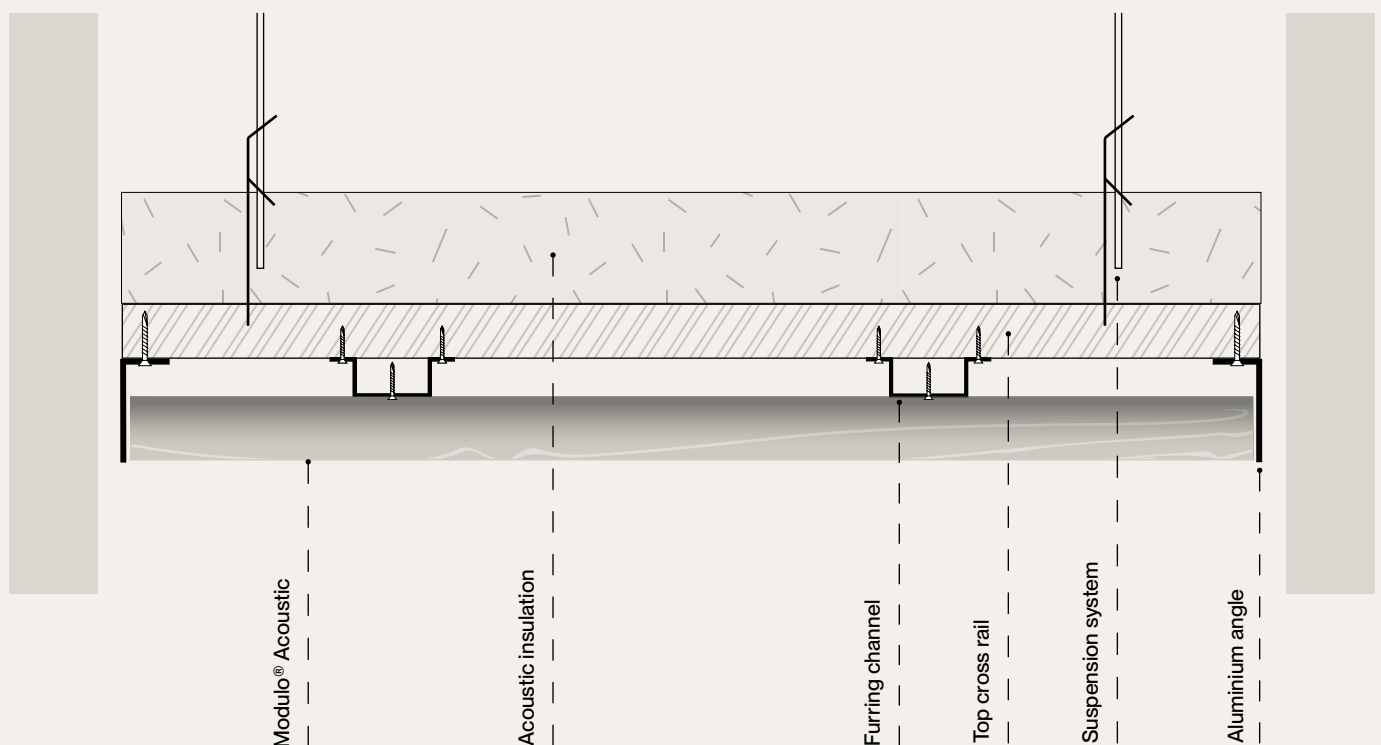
Example of suspended ceiling cross section at 90°, aluminium angle fixed to top cross rail for shadowline detail
